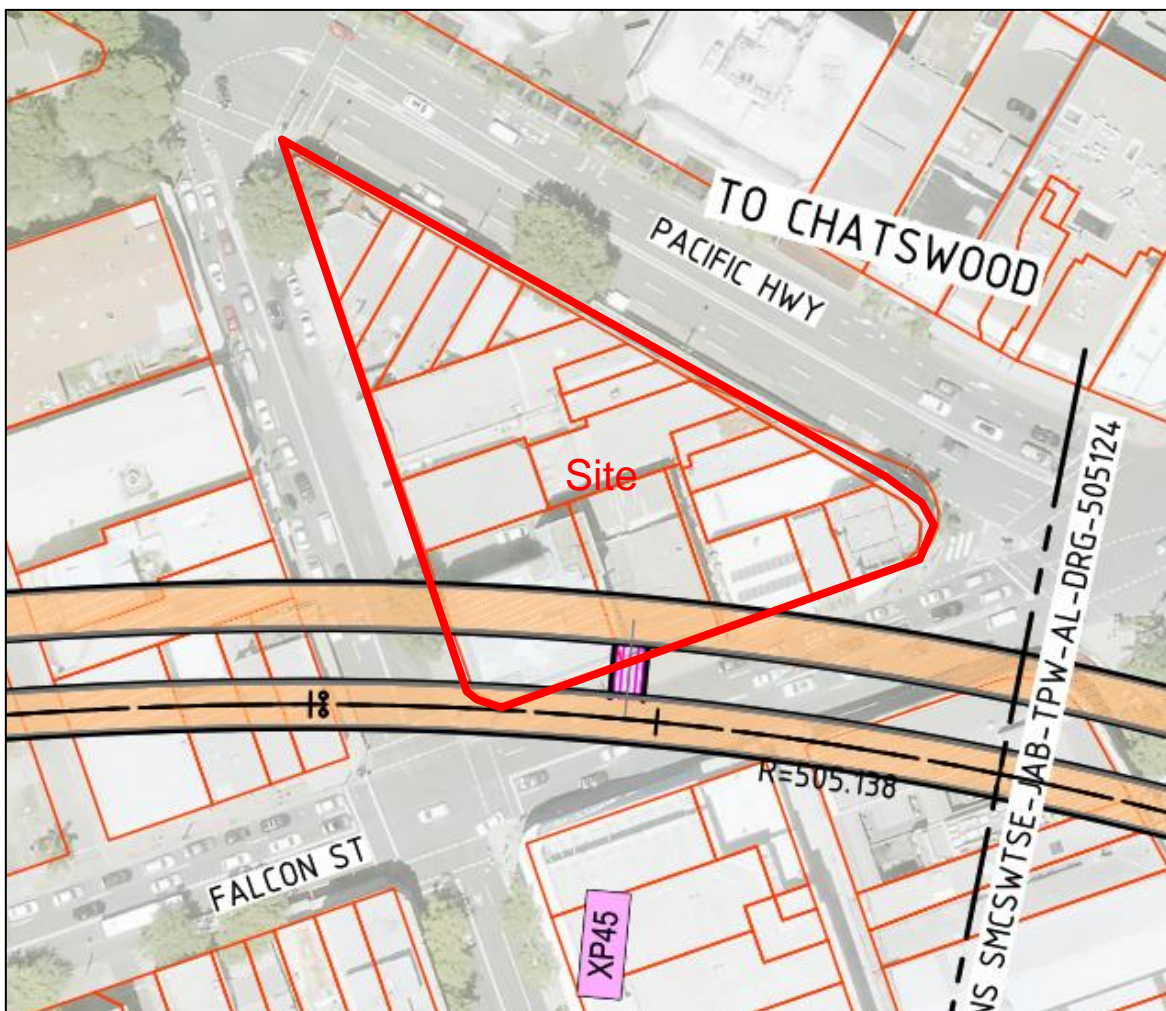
Aerial View of Site with Sydney Metro Tunnel Overlay (note, south up the page)
